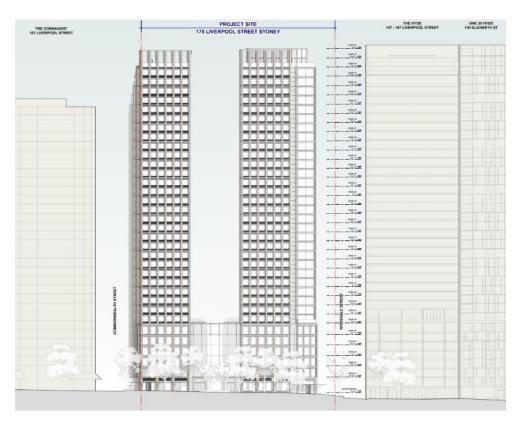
Liverpool Street (north) elevation - Anzac Memorial axis
